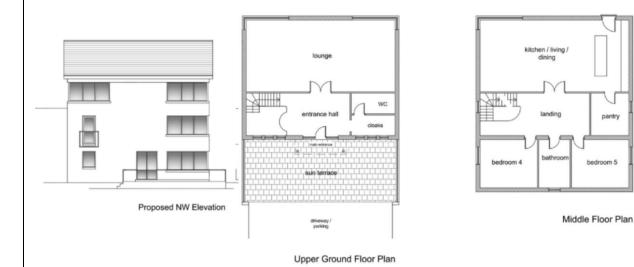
House Type L at Site 25 with 1st and 2nd floor living accommodation
